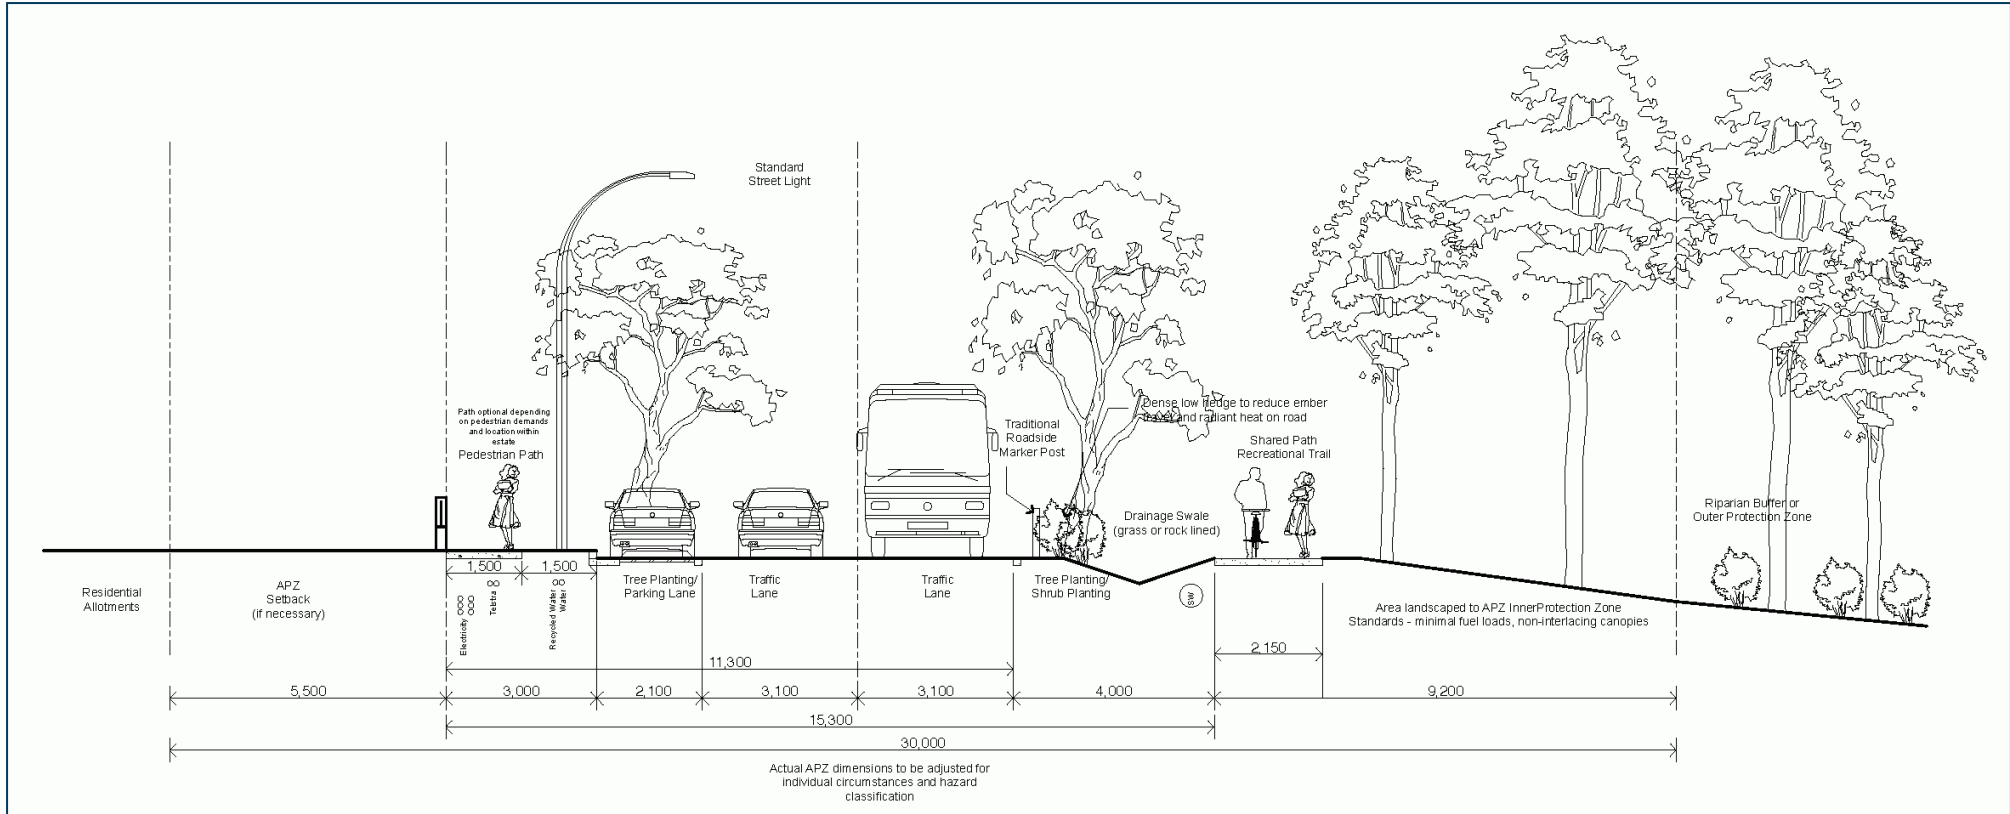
Road Section - Indicative Bushland or Riparian Edge Street
